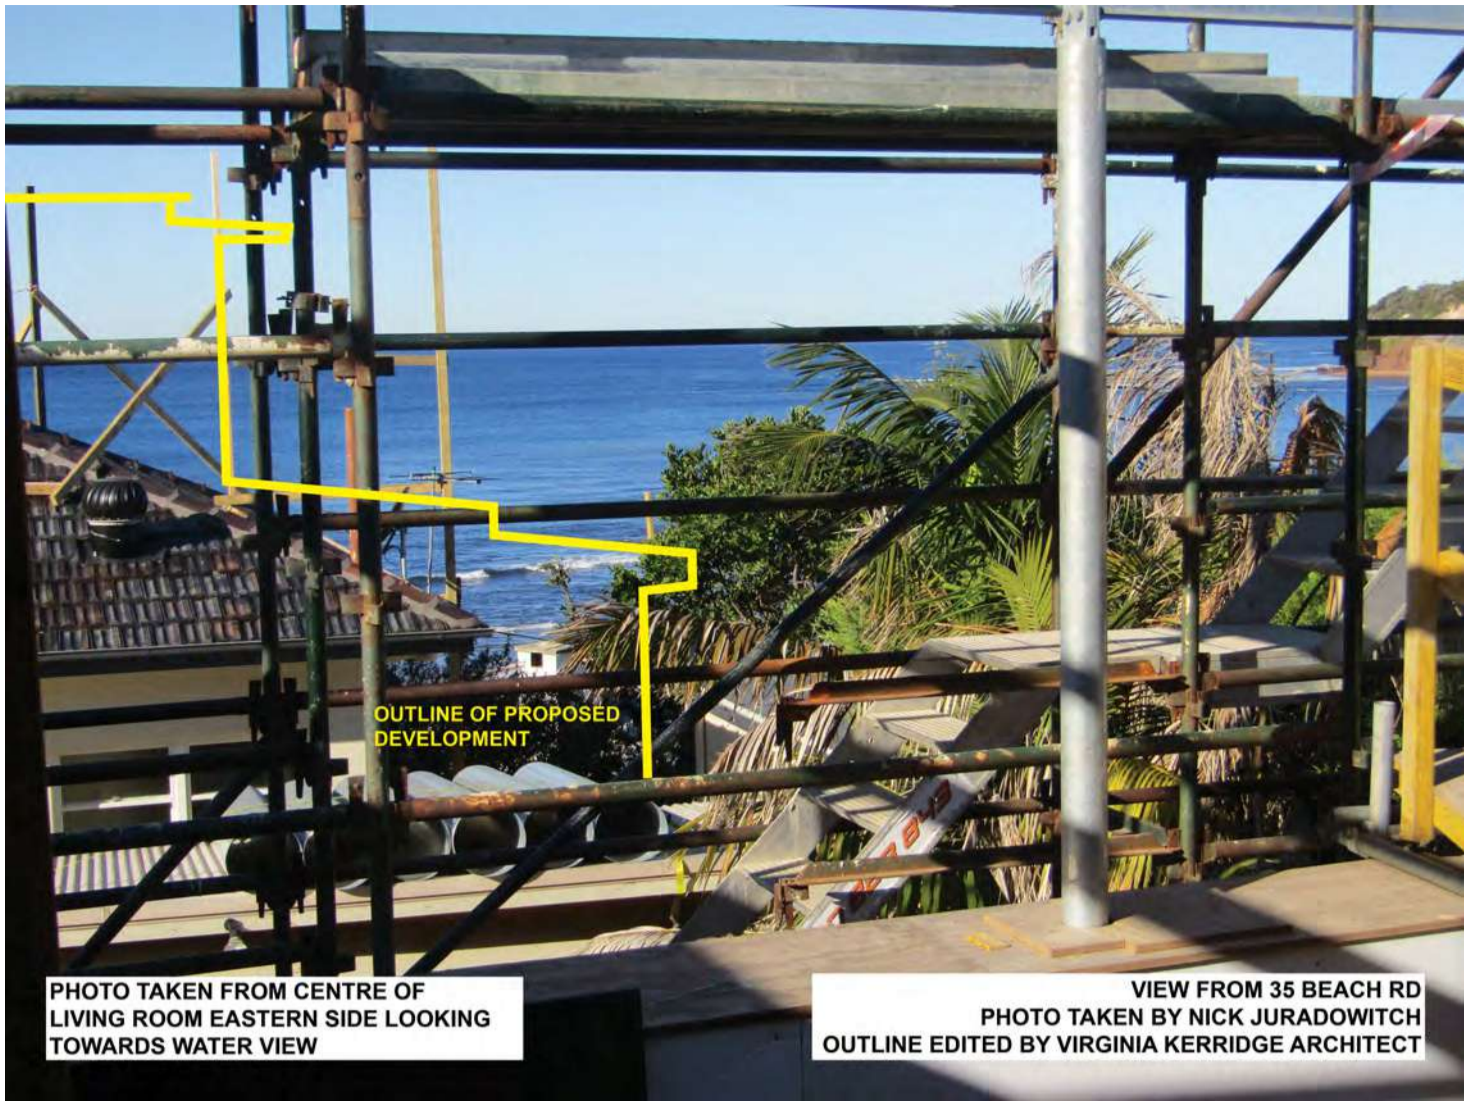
PHOTO EDITED BY VIRGINIA KERRIDGE ARCHITECT.
